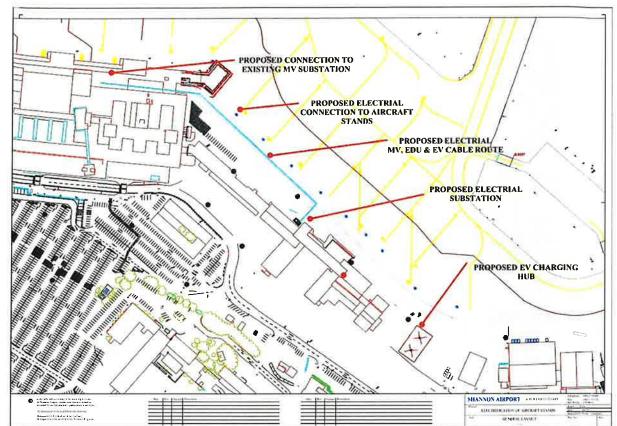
Site Layout – Proposed Electrification Layout within Shannon Airport and the Existing Aircraft Stands
